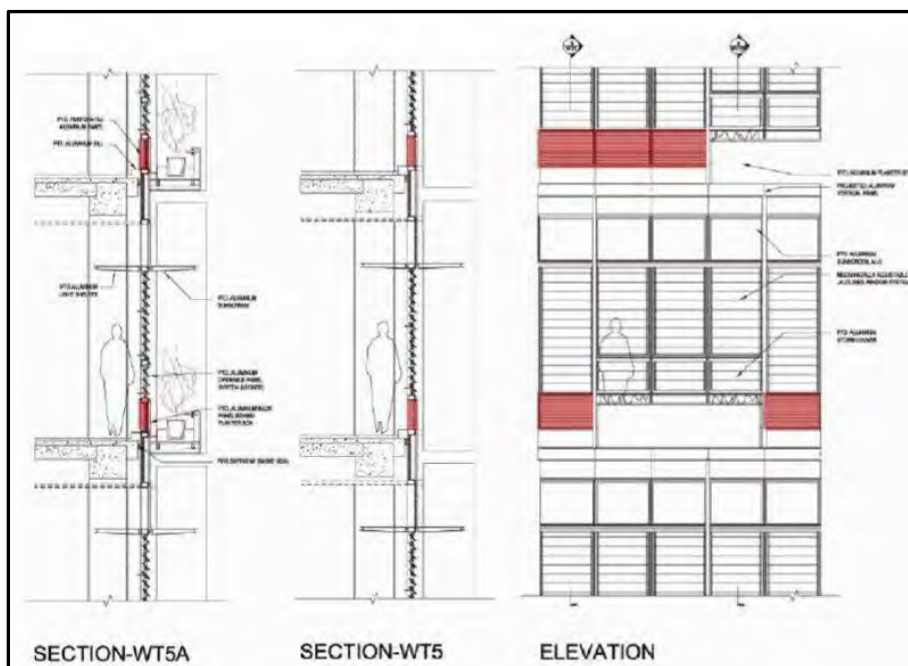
Section and elevation showing wind wall strategy (Source: Yen, 2012:106)
